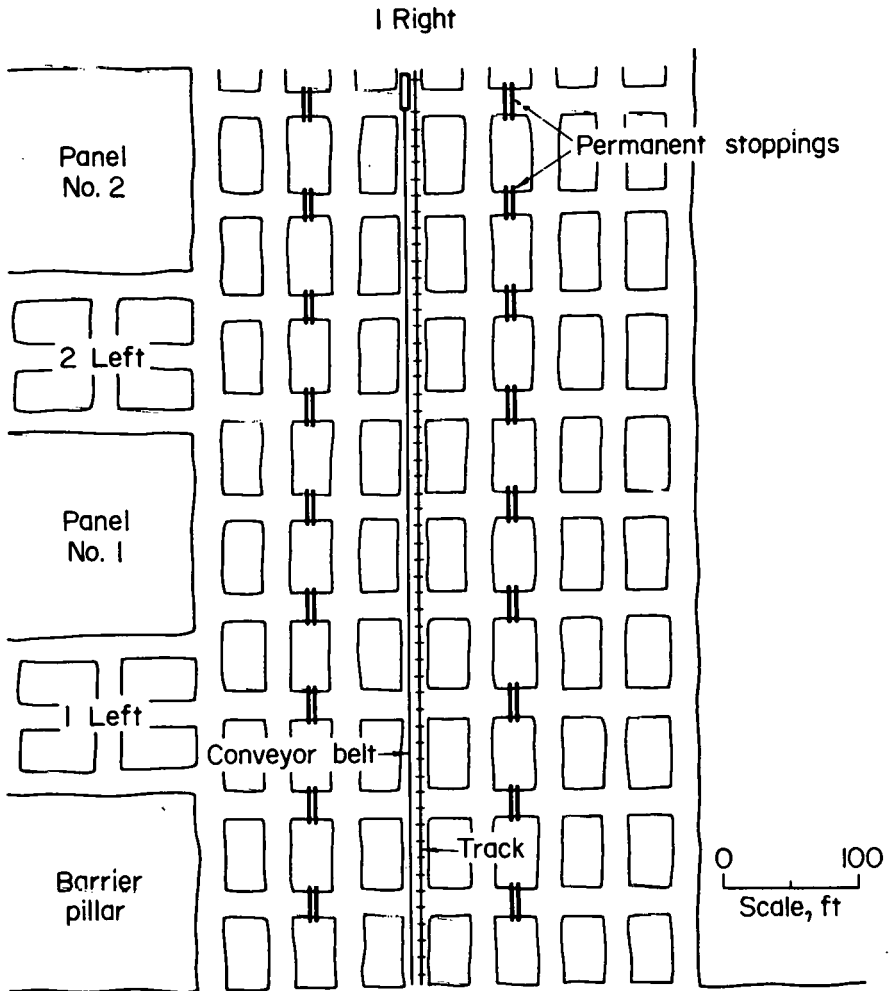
Room-and-Pillar Arrangement, 2 West Section, B Unit.
